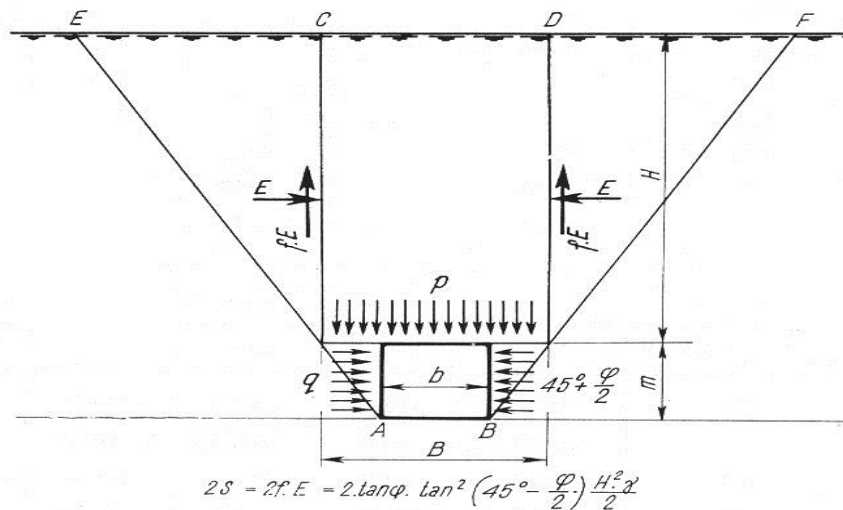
Failure mechanism due to vertical loading (source: - [1])
